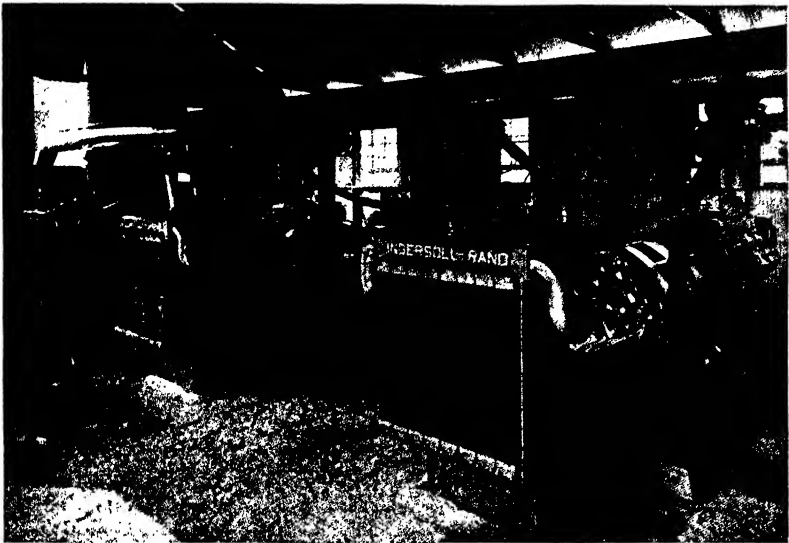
Radiator-cooled electric-drive compressors, Bates & Rogers Construction Corp., Pennsylvania Turnpike tunnels. Compressors are double compound units, driven by a single motor. (Courtesy of Ingersoll-Rand Co.)
